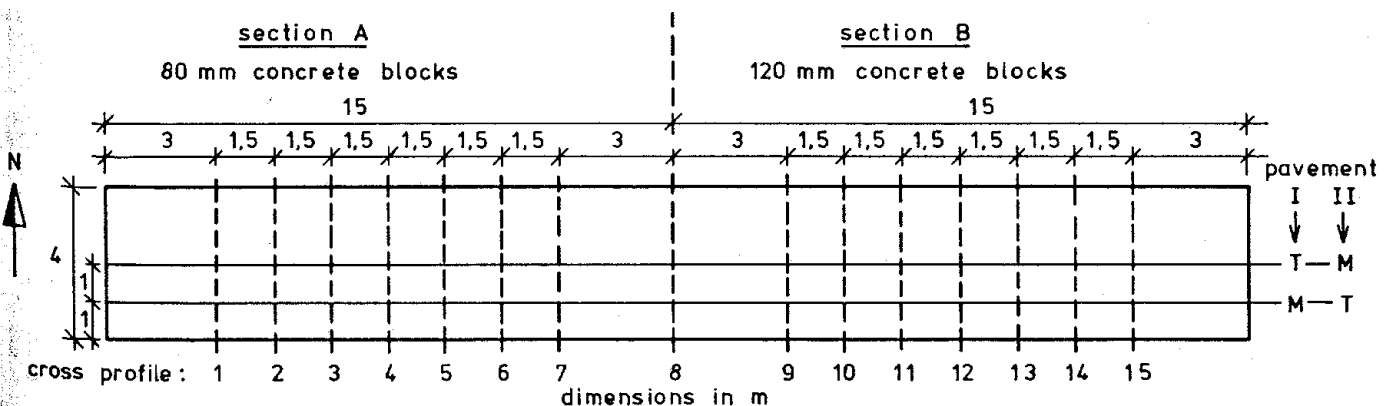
Cross profiles (survey lines) for the test pavements, and location of wheeltrack (T).
